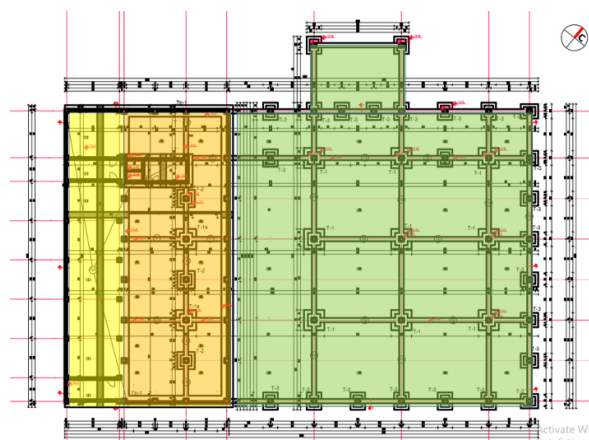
Different types of foundations represented on a Foundation Floor Plan
